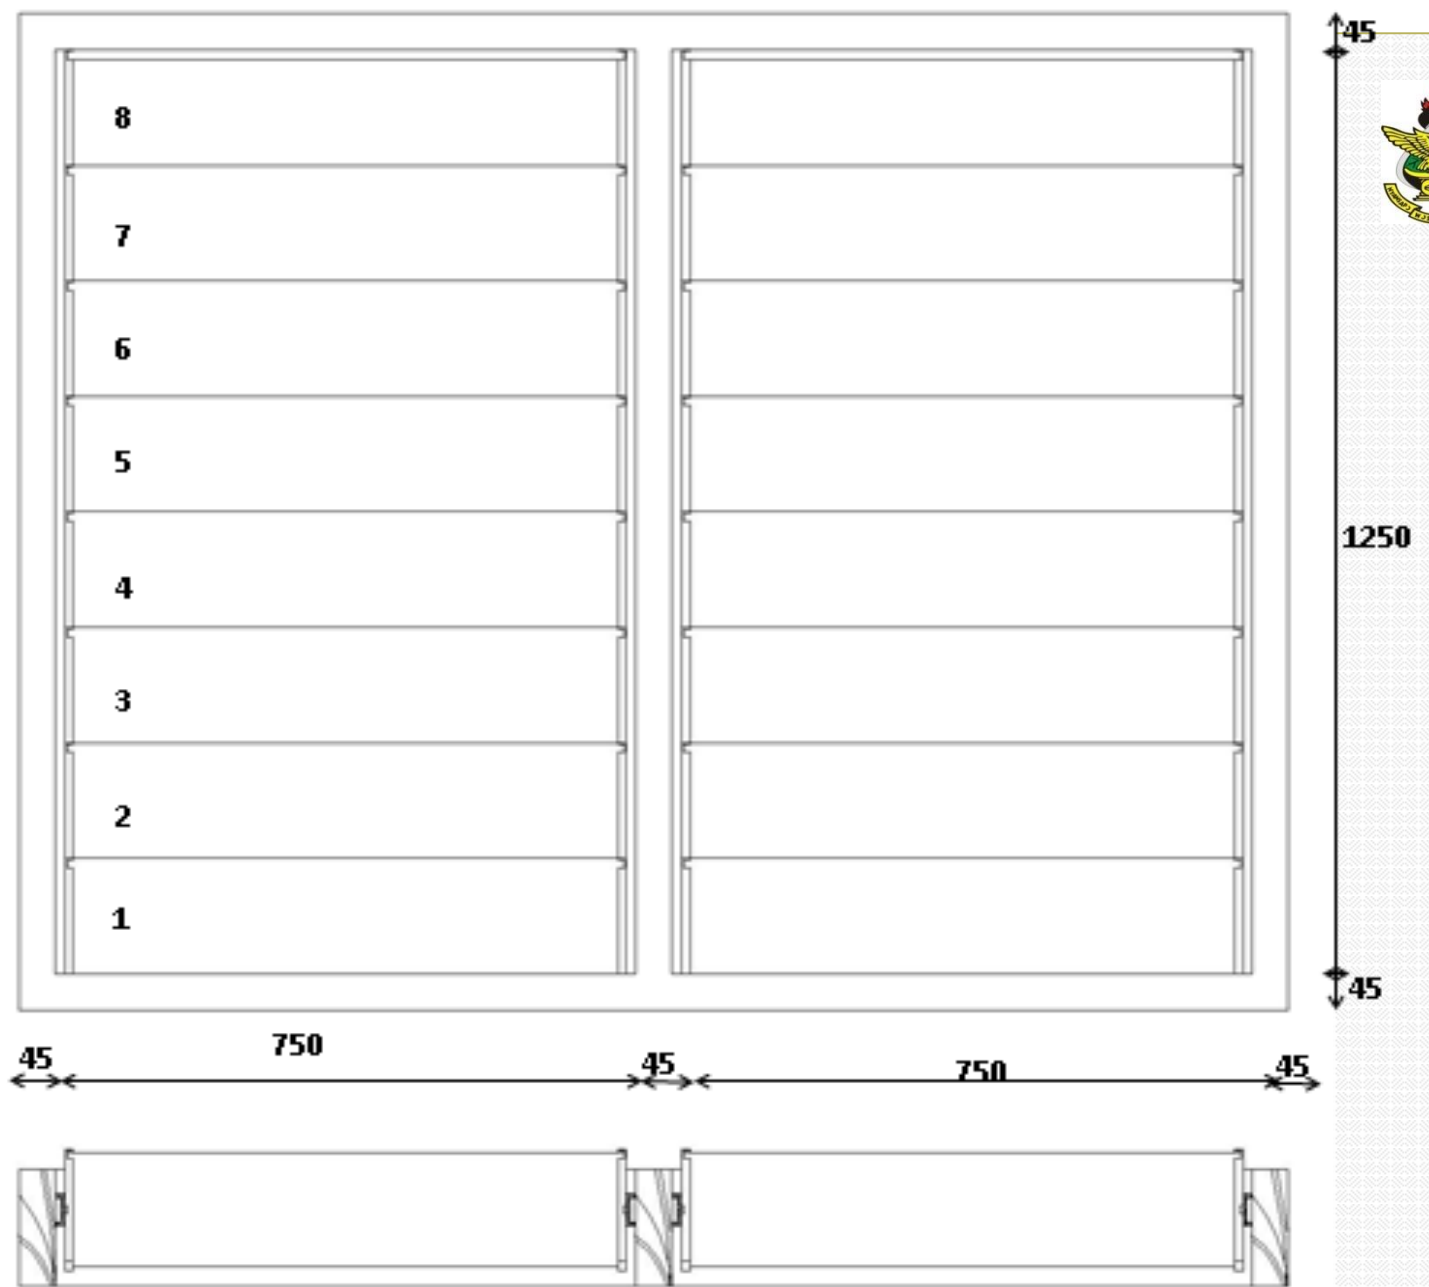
Framed & Glass Louvred, 2 – Bay Window
